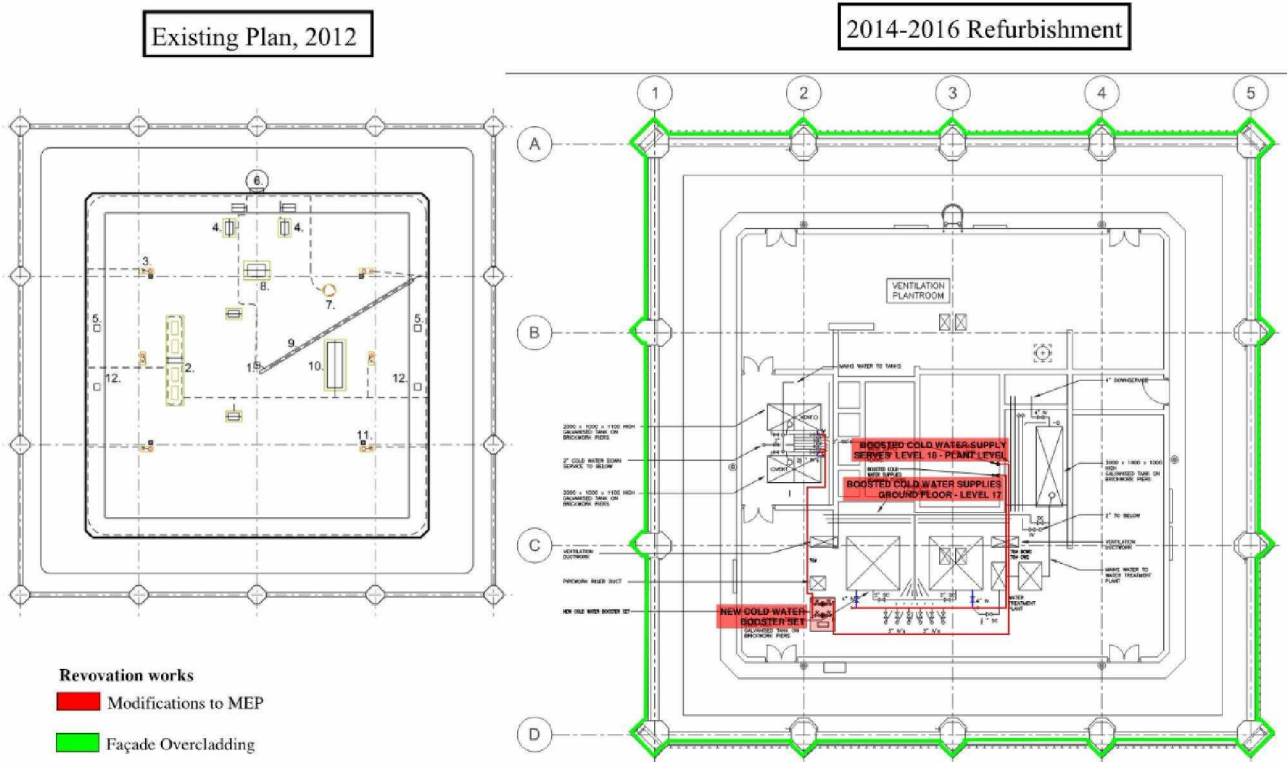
Roof level – refurbishment plan and existing 2012 roof plan (MAX00000879, RYD00000577)
